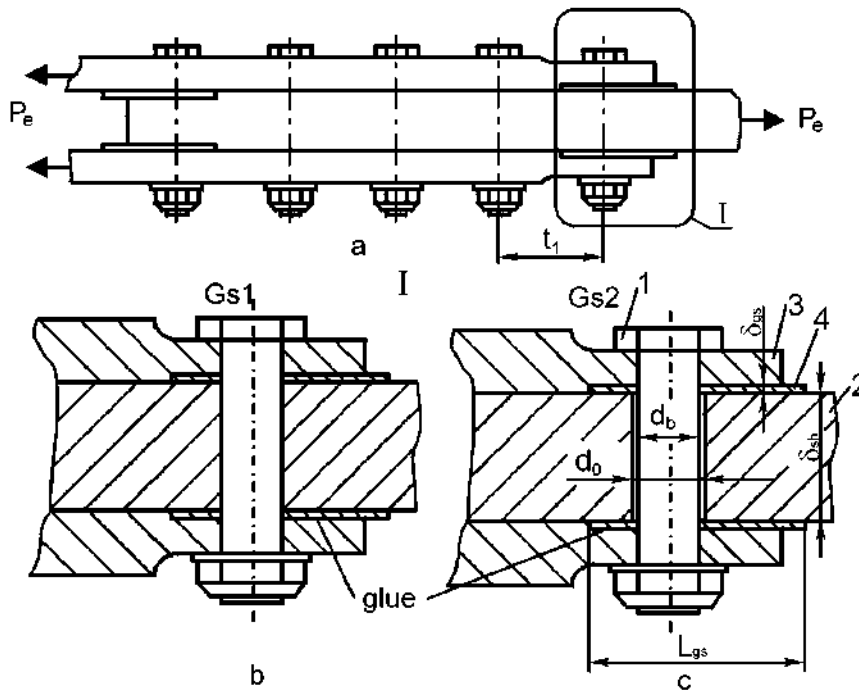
Structure of discharge gaskets in multi-row joint
